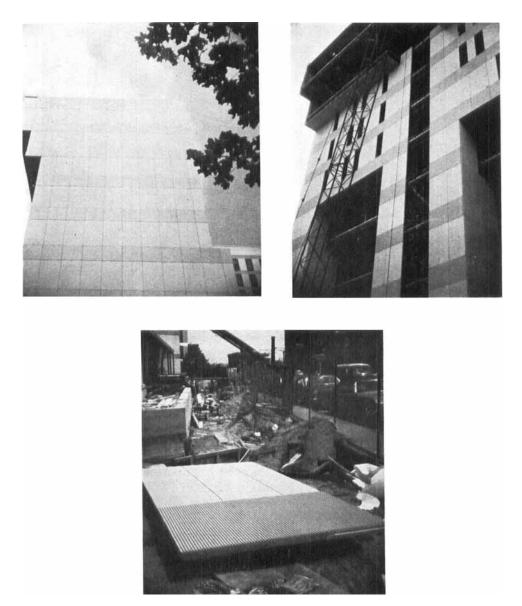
Sandwich wall panels with glass fabric reinforced polyester concrete facings and foamed polyurethane core. (top pictures) panels in place (bottom picture) single three-inch thick panel.
